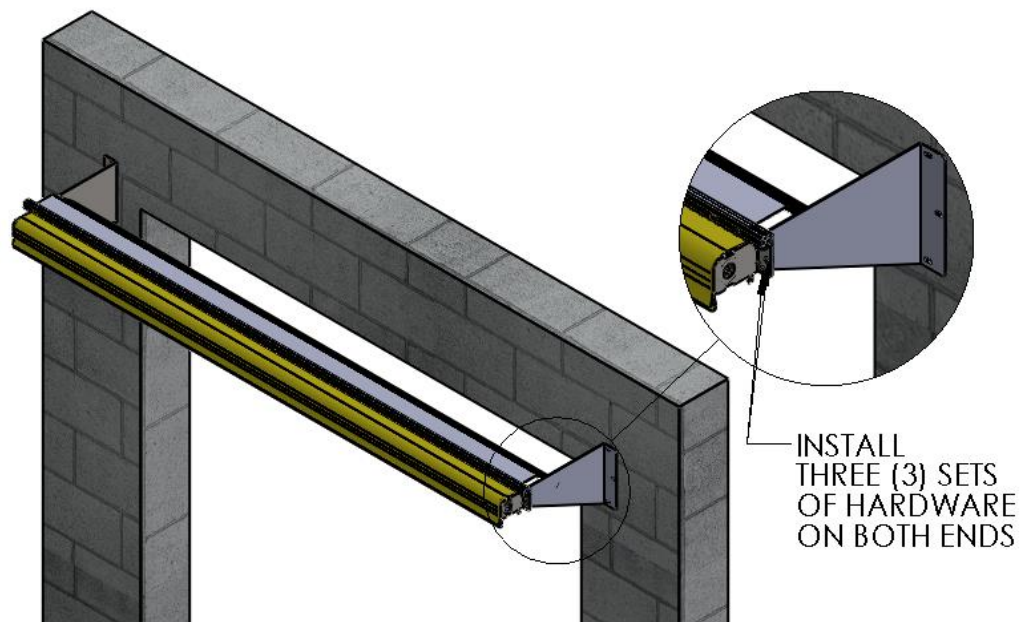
MOUNT HEADER ASSEMBLY TO OFFSET BRACKETS
